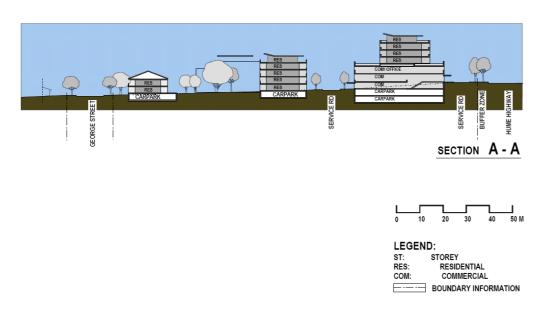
Proposed building envelope for mixed use development on the consolidated sites as viewed from the Hume Highway (not to scale)
